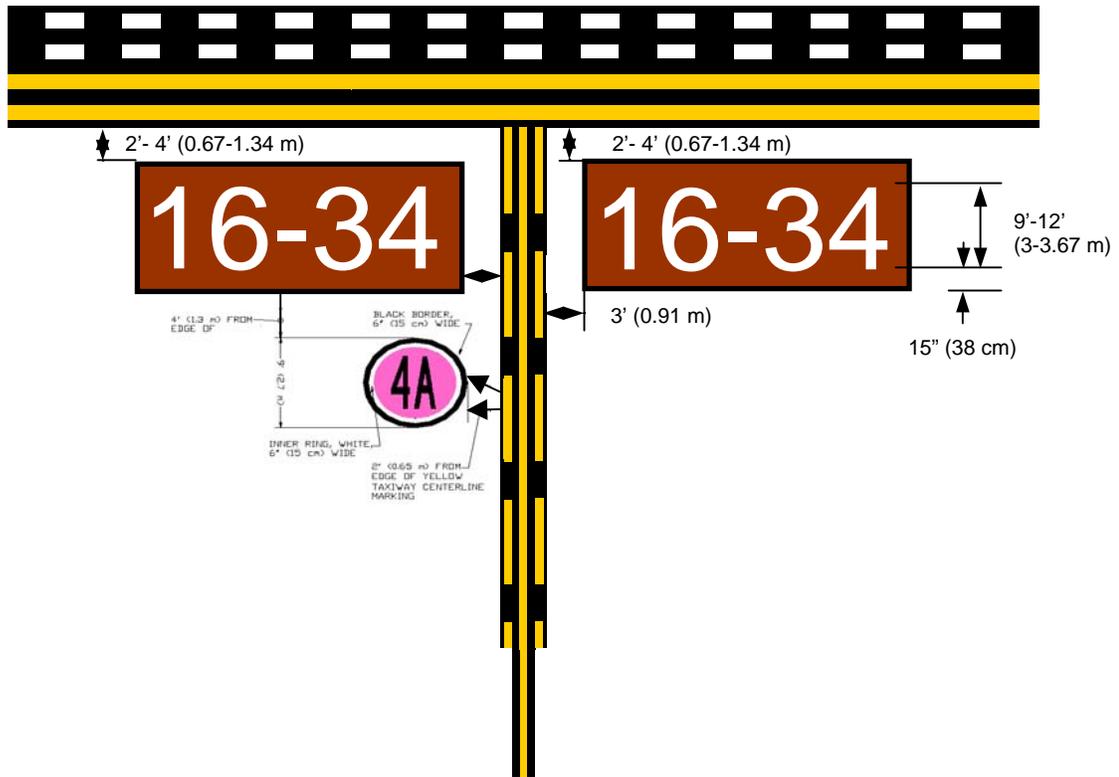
A. Surface Painted Holding Position Signs when Taxiway Centerline is not Perpendicular to Runway Holding Position Marking
